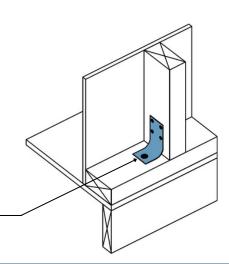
TIMBER FLOORS • INTERNAL WALLS
